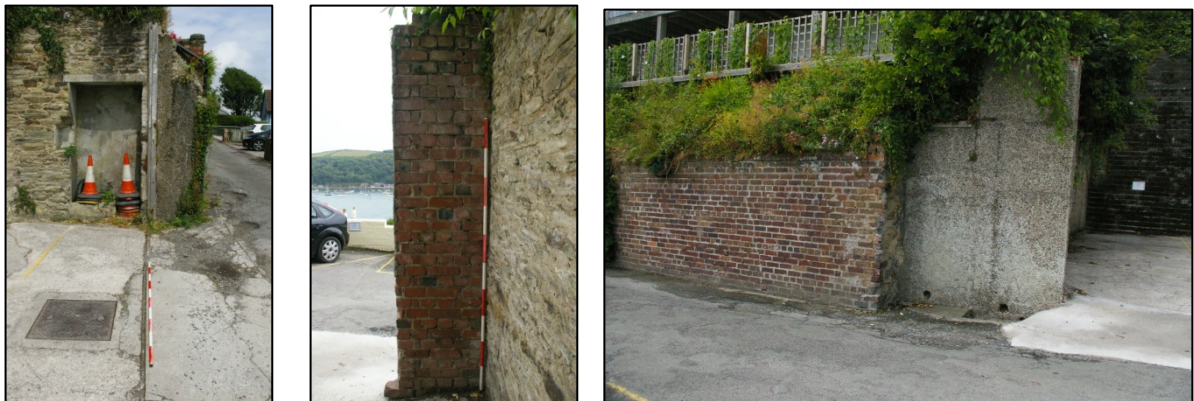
View of blocked doorway, and metal runner along site frontage; viewed from the west (2m scale)
